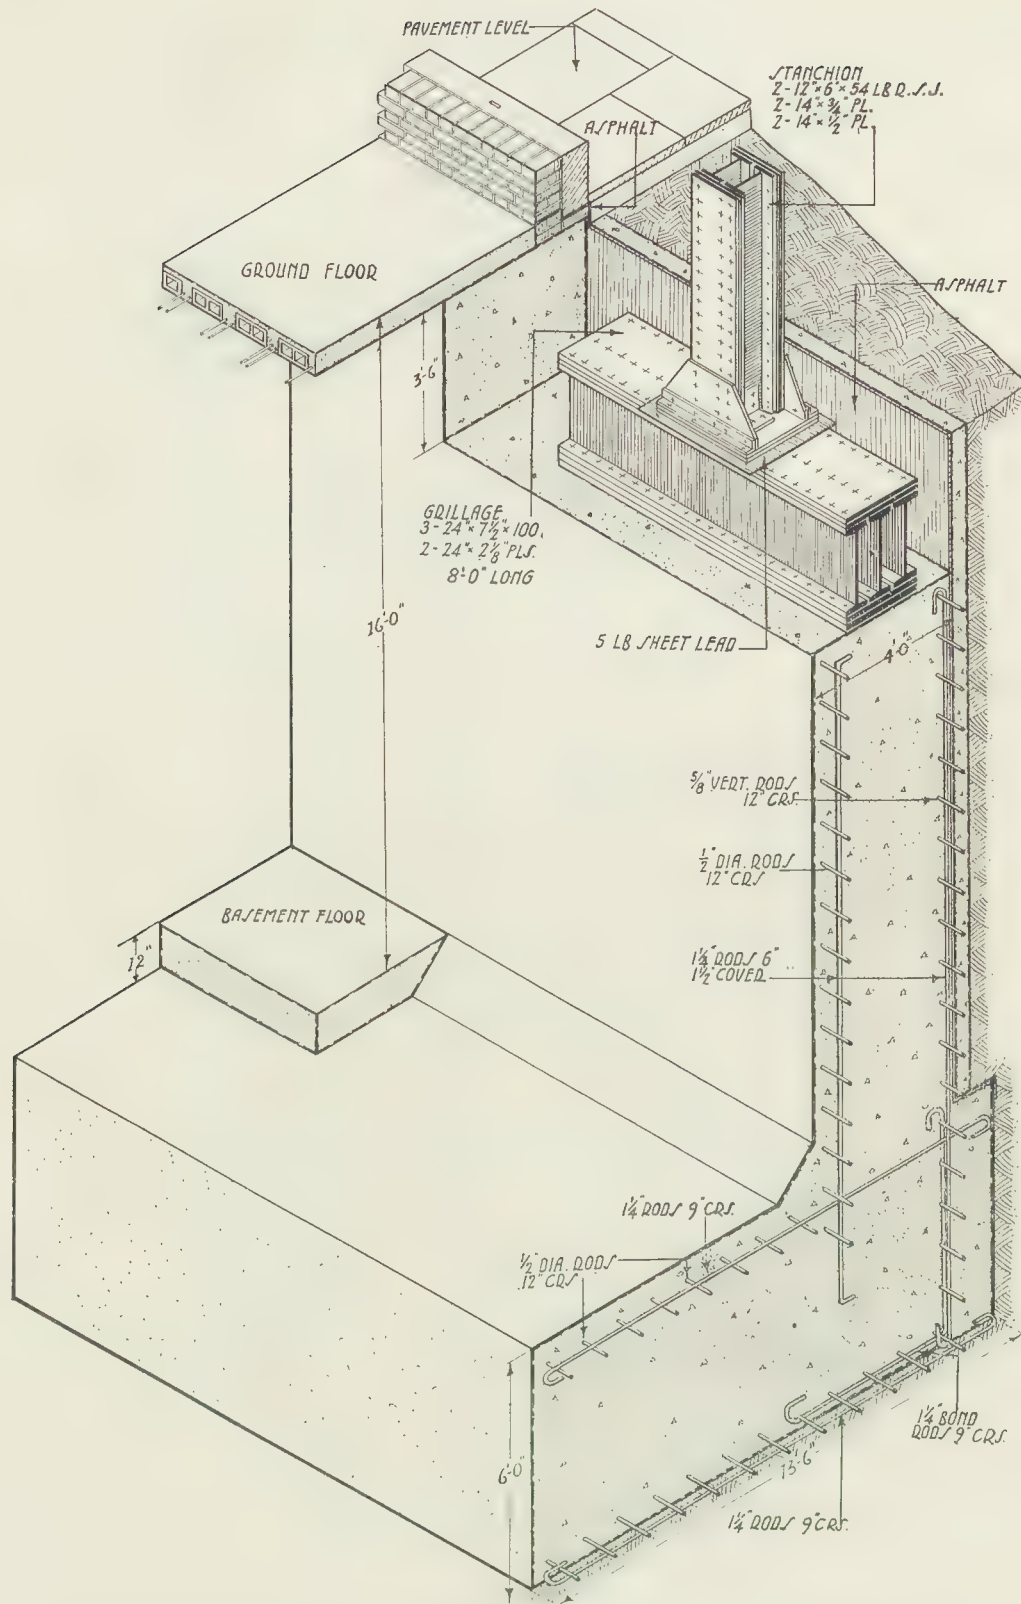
REINFORCED CONCRETE RETAINING WALL SUPPORTING STEEL STANCHION
